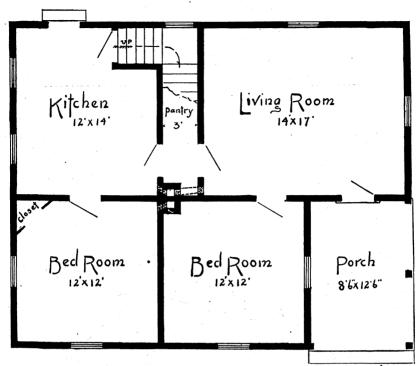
First floor of \$1 000 house. (Design No. 2.)
